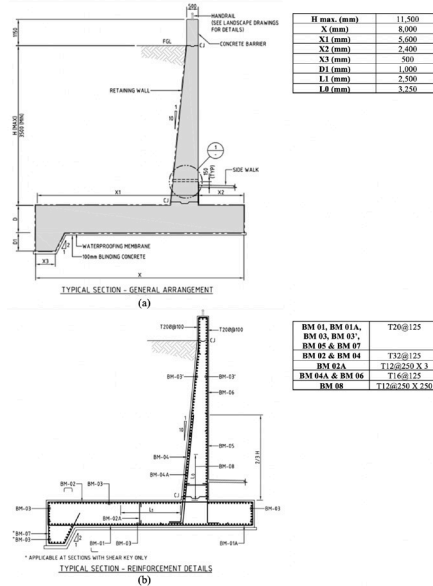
The proposed cross-sectional of the cantilever retaining wall system
